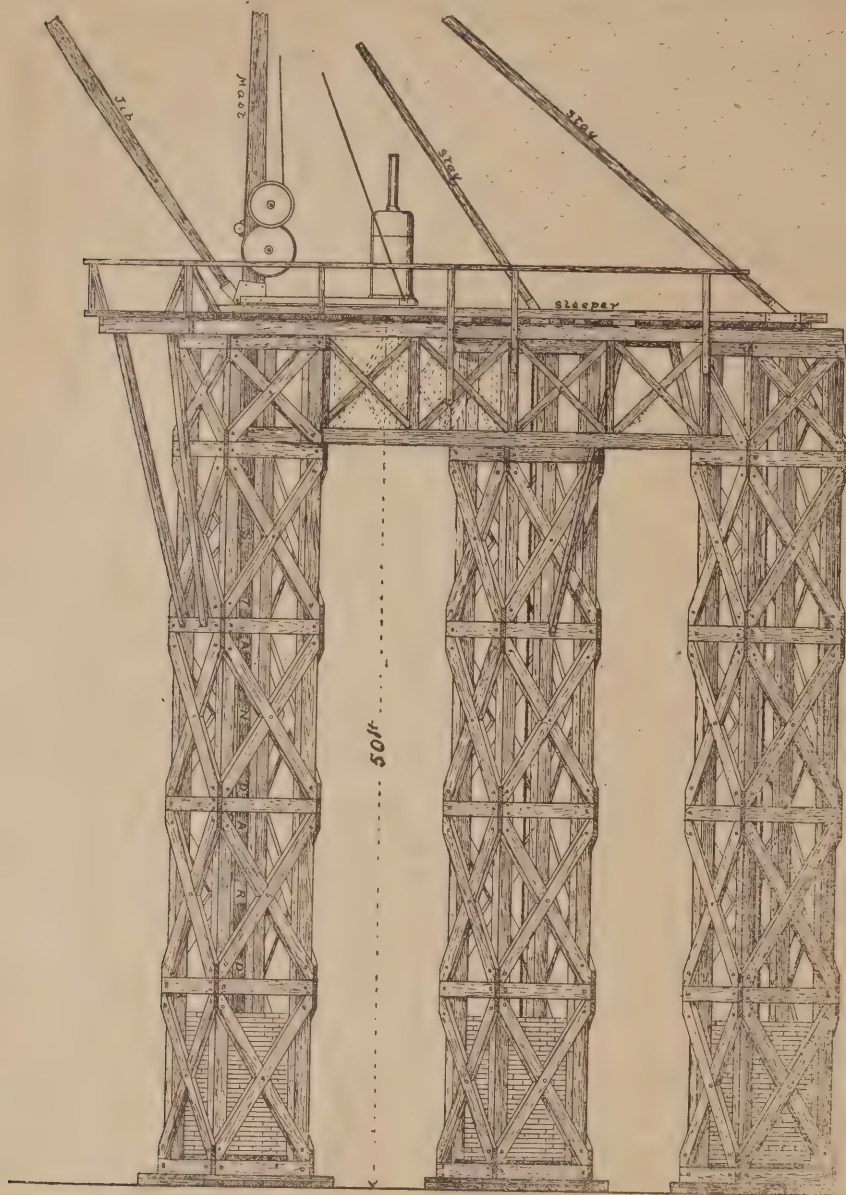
ELEVATION OF A DERRICK TOWER GANTRY.
